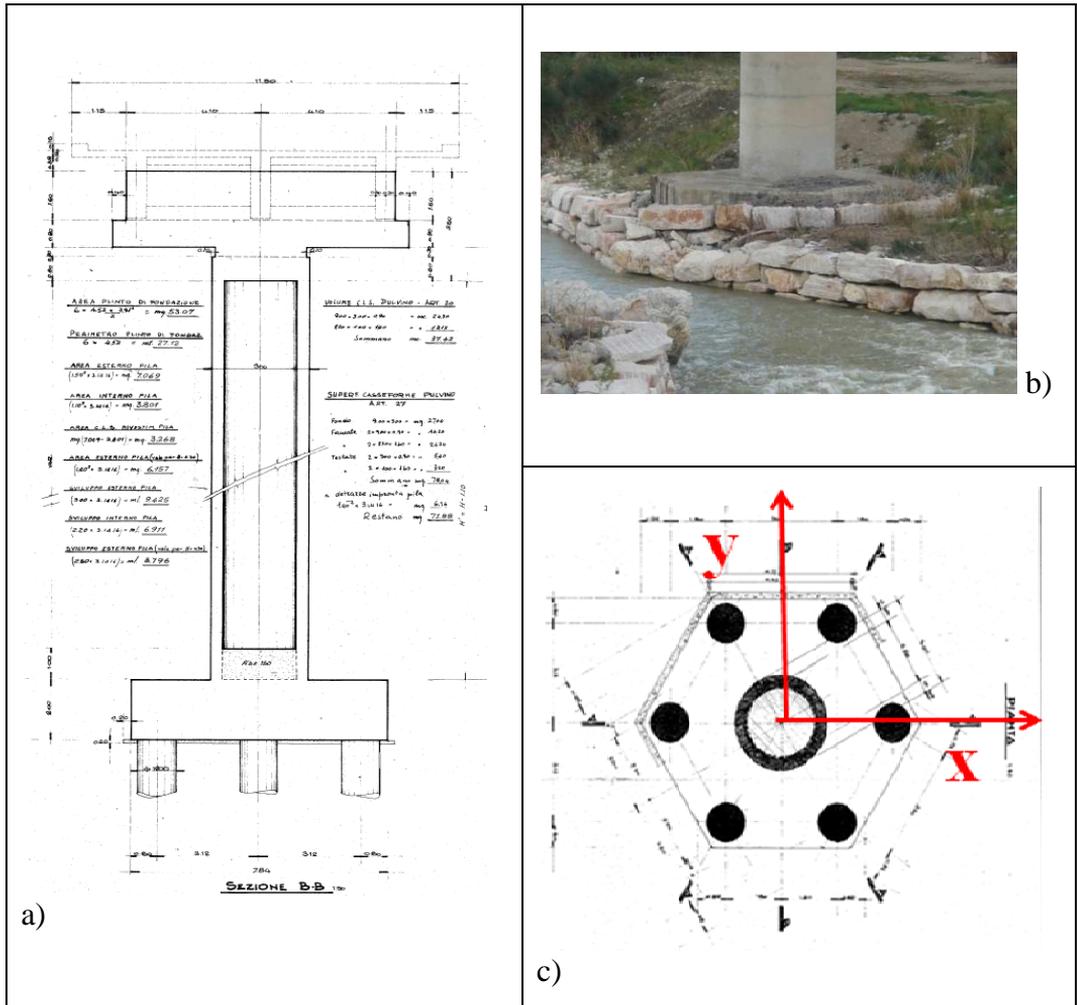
Examples of viaduct whitt on piles foundations. a) Longitudinal pier section; b) Picture of foundation; c) Foundation dimensions in plant. Dimensions are in meters.
